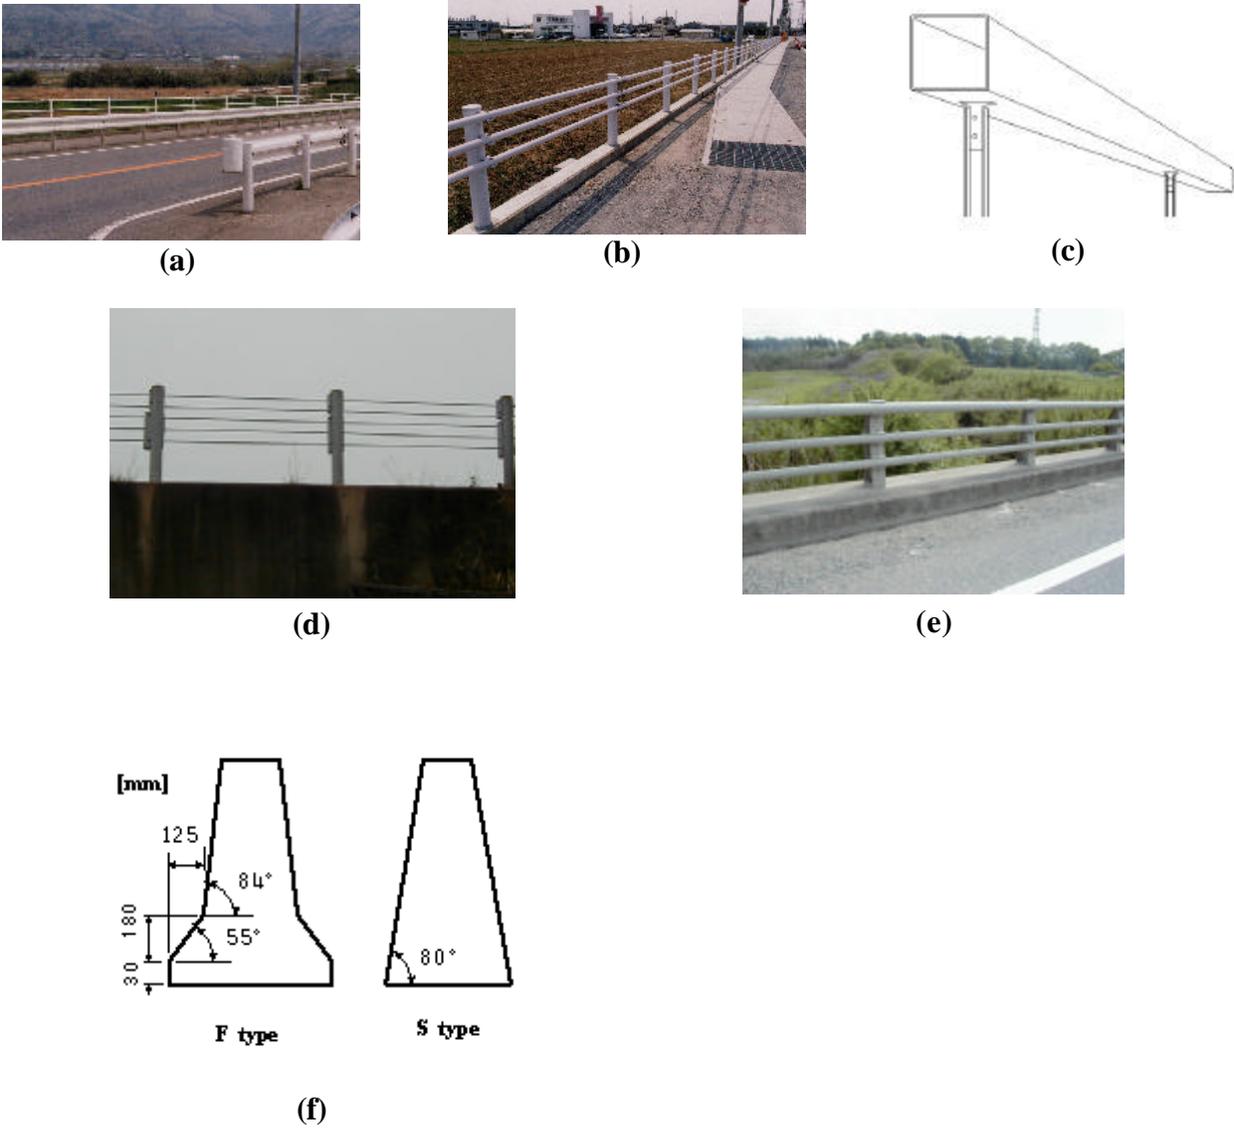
Types of traffic barriers: (a) guard rail; (b) guard pipe; (c) box beam; (d) cable-type traffic barrier; (e) bridge railing; (f) rigid traffic barrier.
